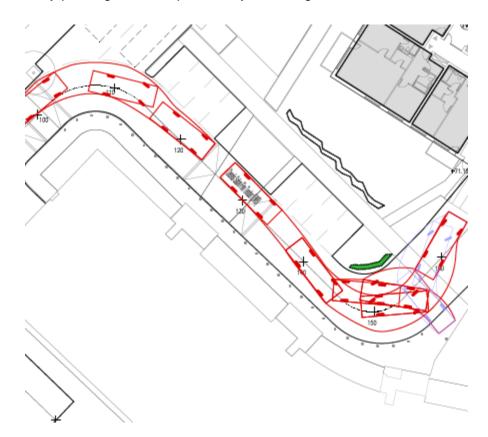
Bollards Adjacent to Carriageway at Crossing Points
